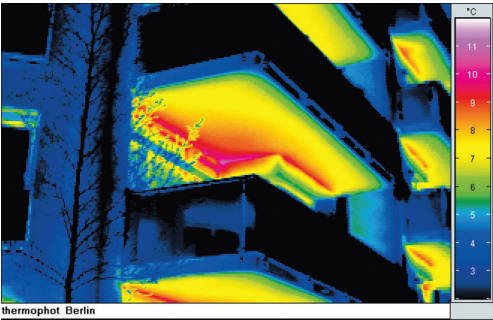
Thermographic image demonstrates heat loss caused by thermal bridge at concrete balcony. Surface temperature drops from approximately 52°F (11°C) near building to less than 41°F (5°C) at balcony edge as concrete conducts heat from building interior to outside environment. Thermal bridges not only waste energy, they can lead to local cold spots on walls and ceilings that can result in condensation and mold.
